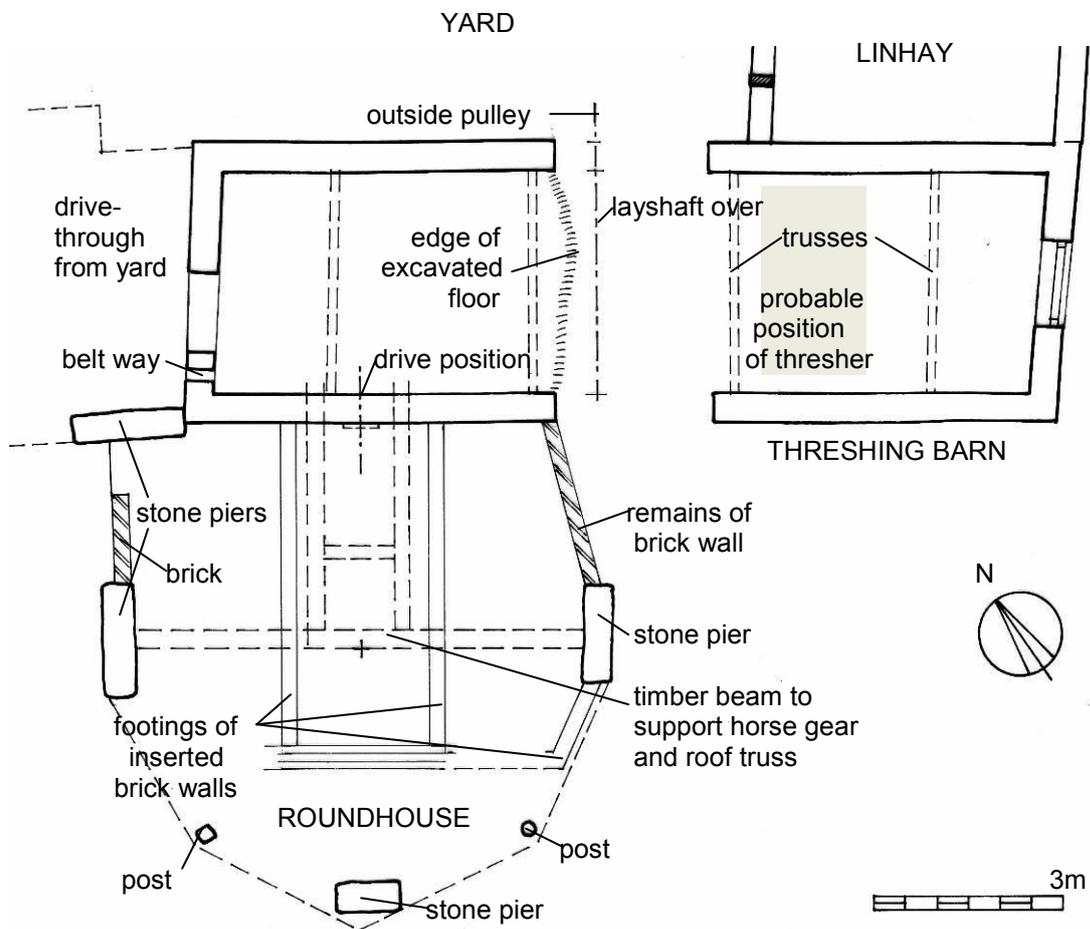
Muddifords Court, Halberton. Plan of threshing barn and roundhouse
